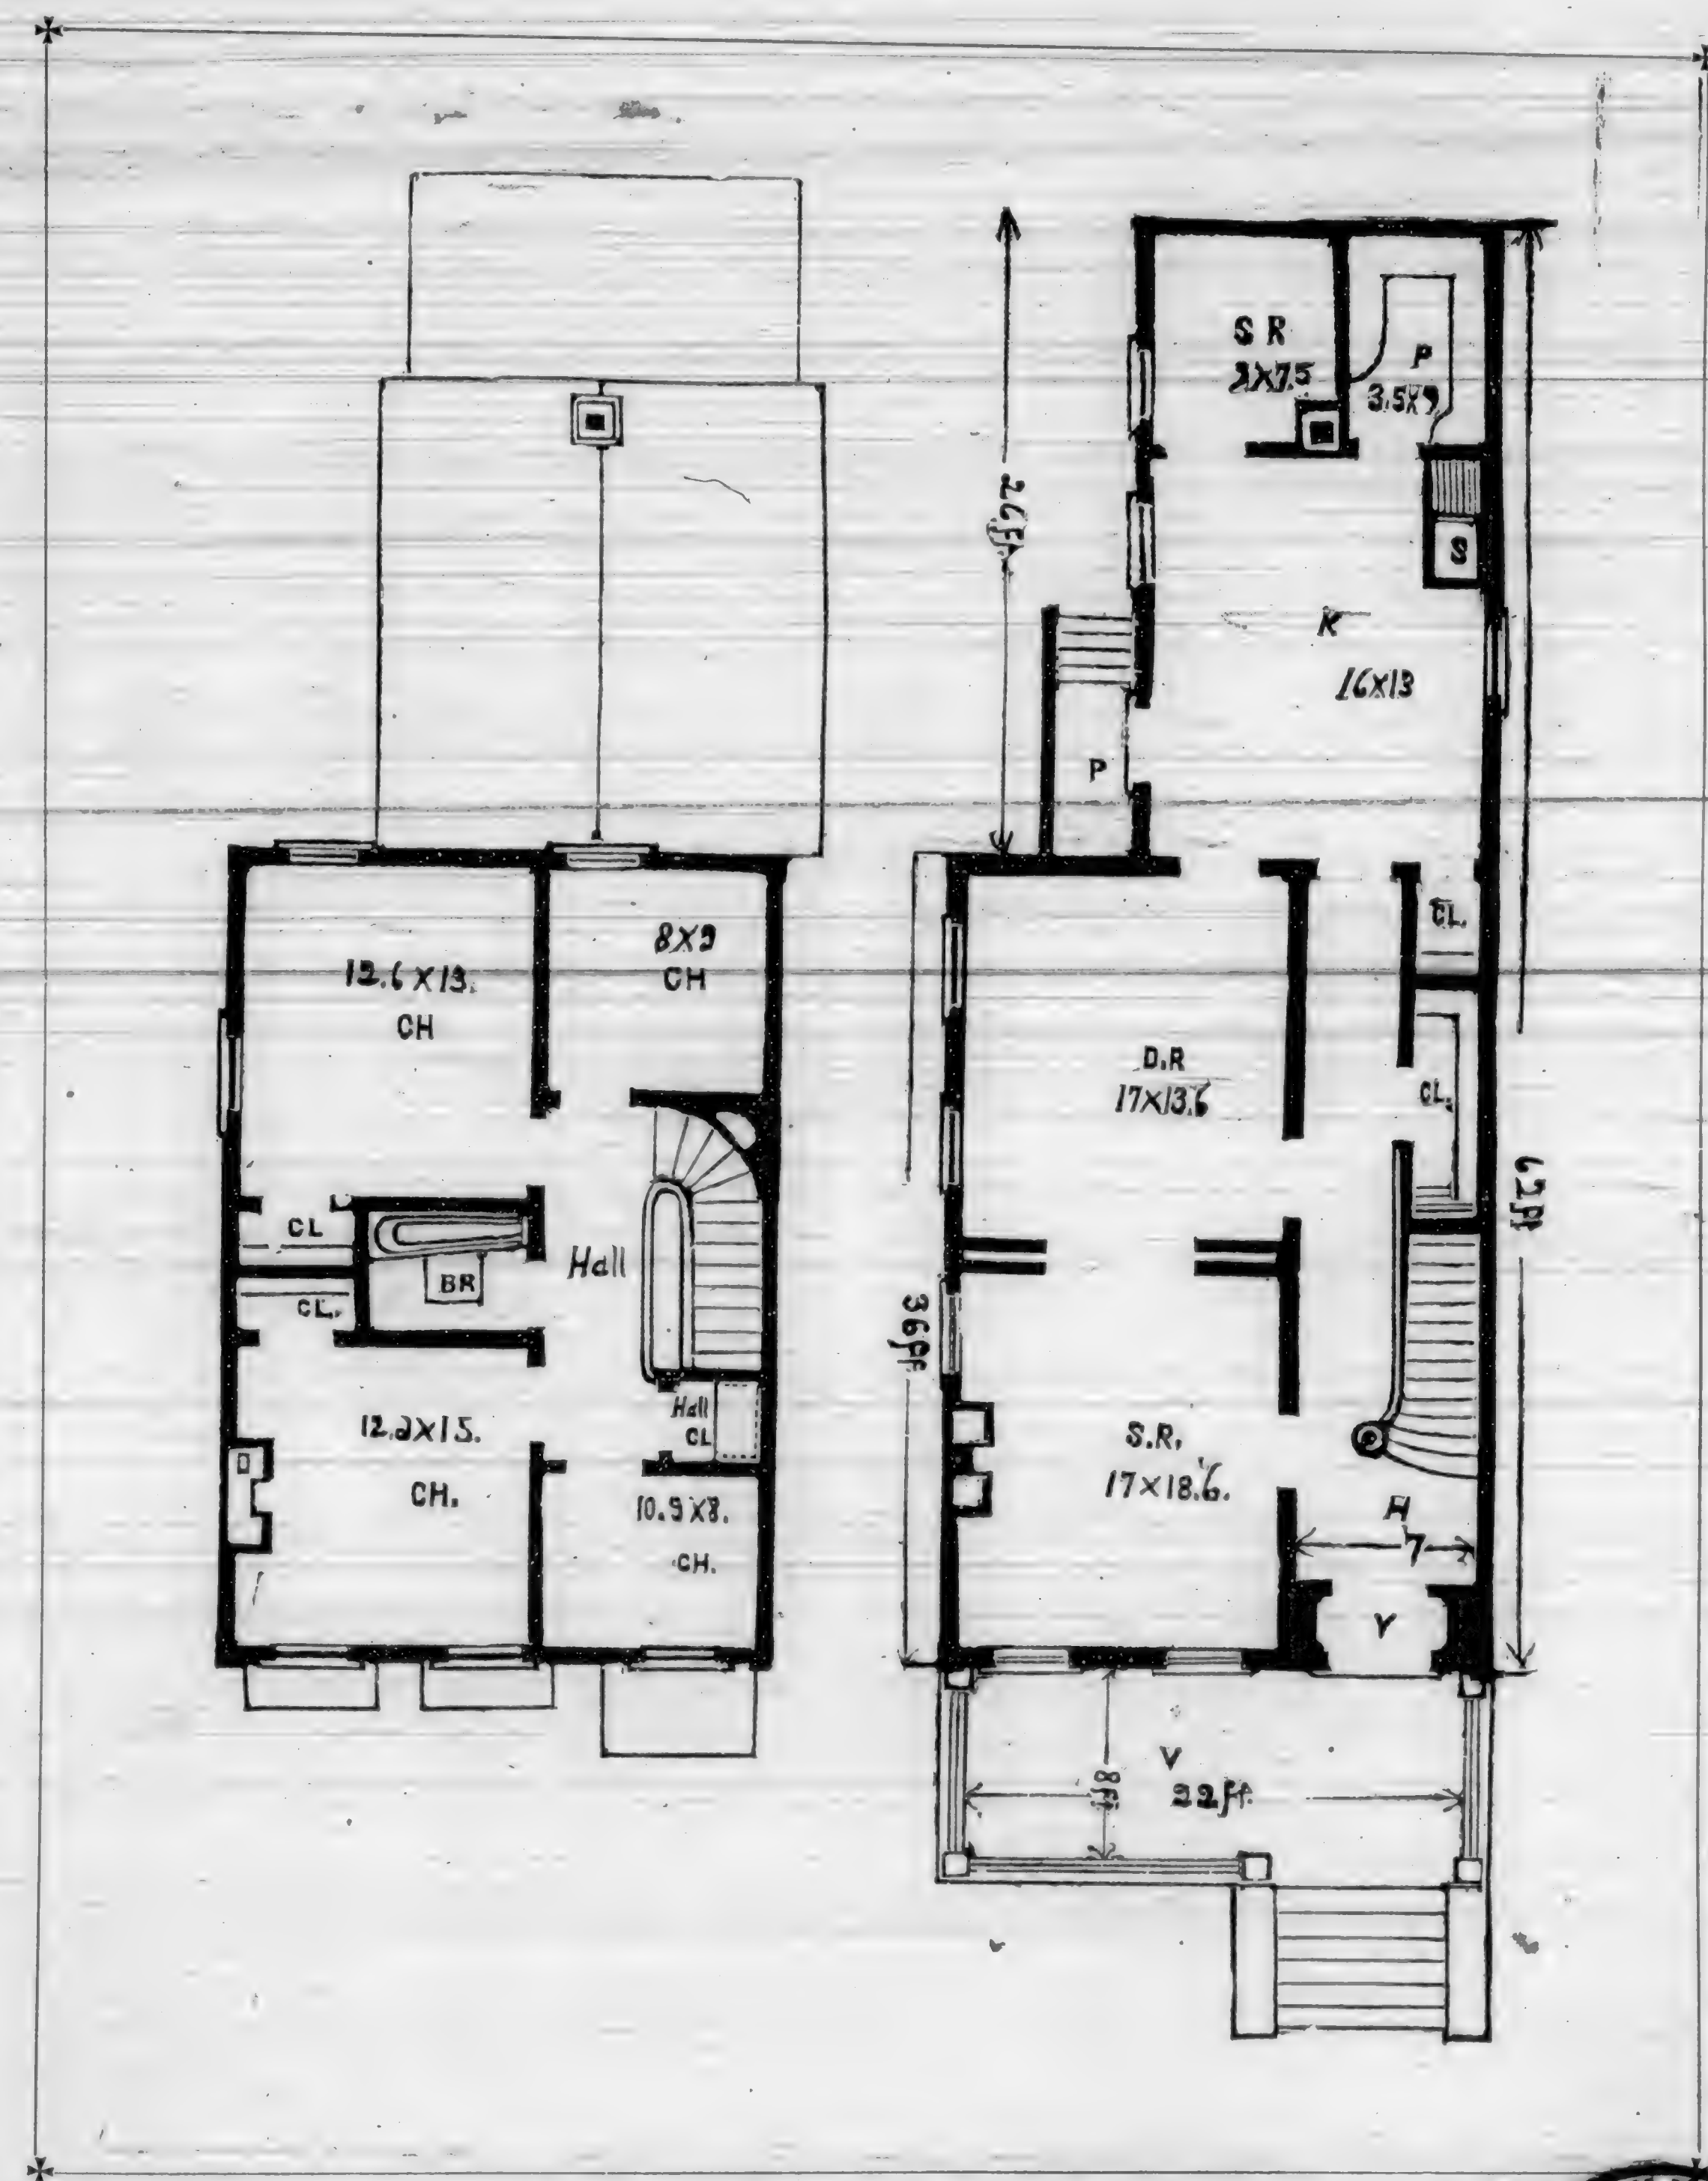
GROUND PLAN FOR COUNTRY RESIDENCE.
